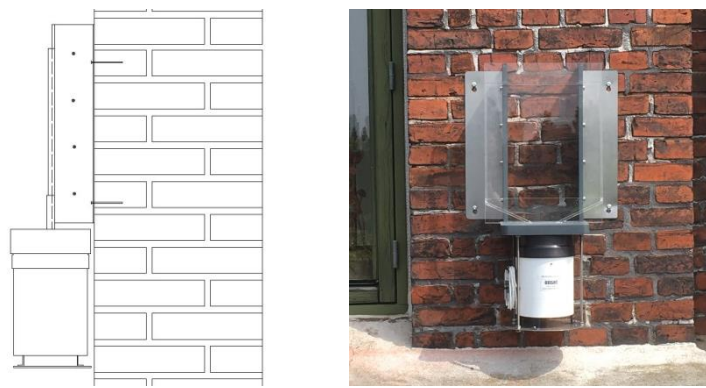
Wall-mounted WDR gauge with HOBO logger. Illustration (left) shows fixation and extension from surface. Image (right) illustrates fixation to façade (test building 1)
